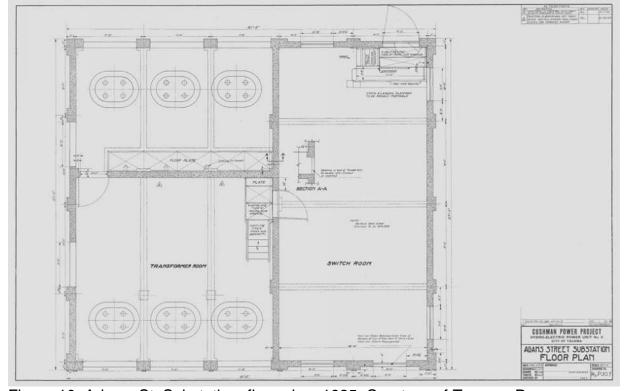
Adams St. Substation, floor plan, 1925. Courtesy of Tacoma Power.
